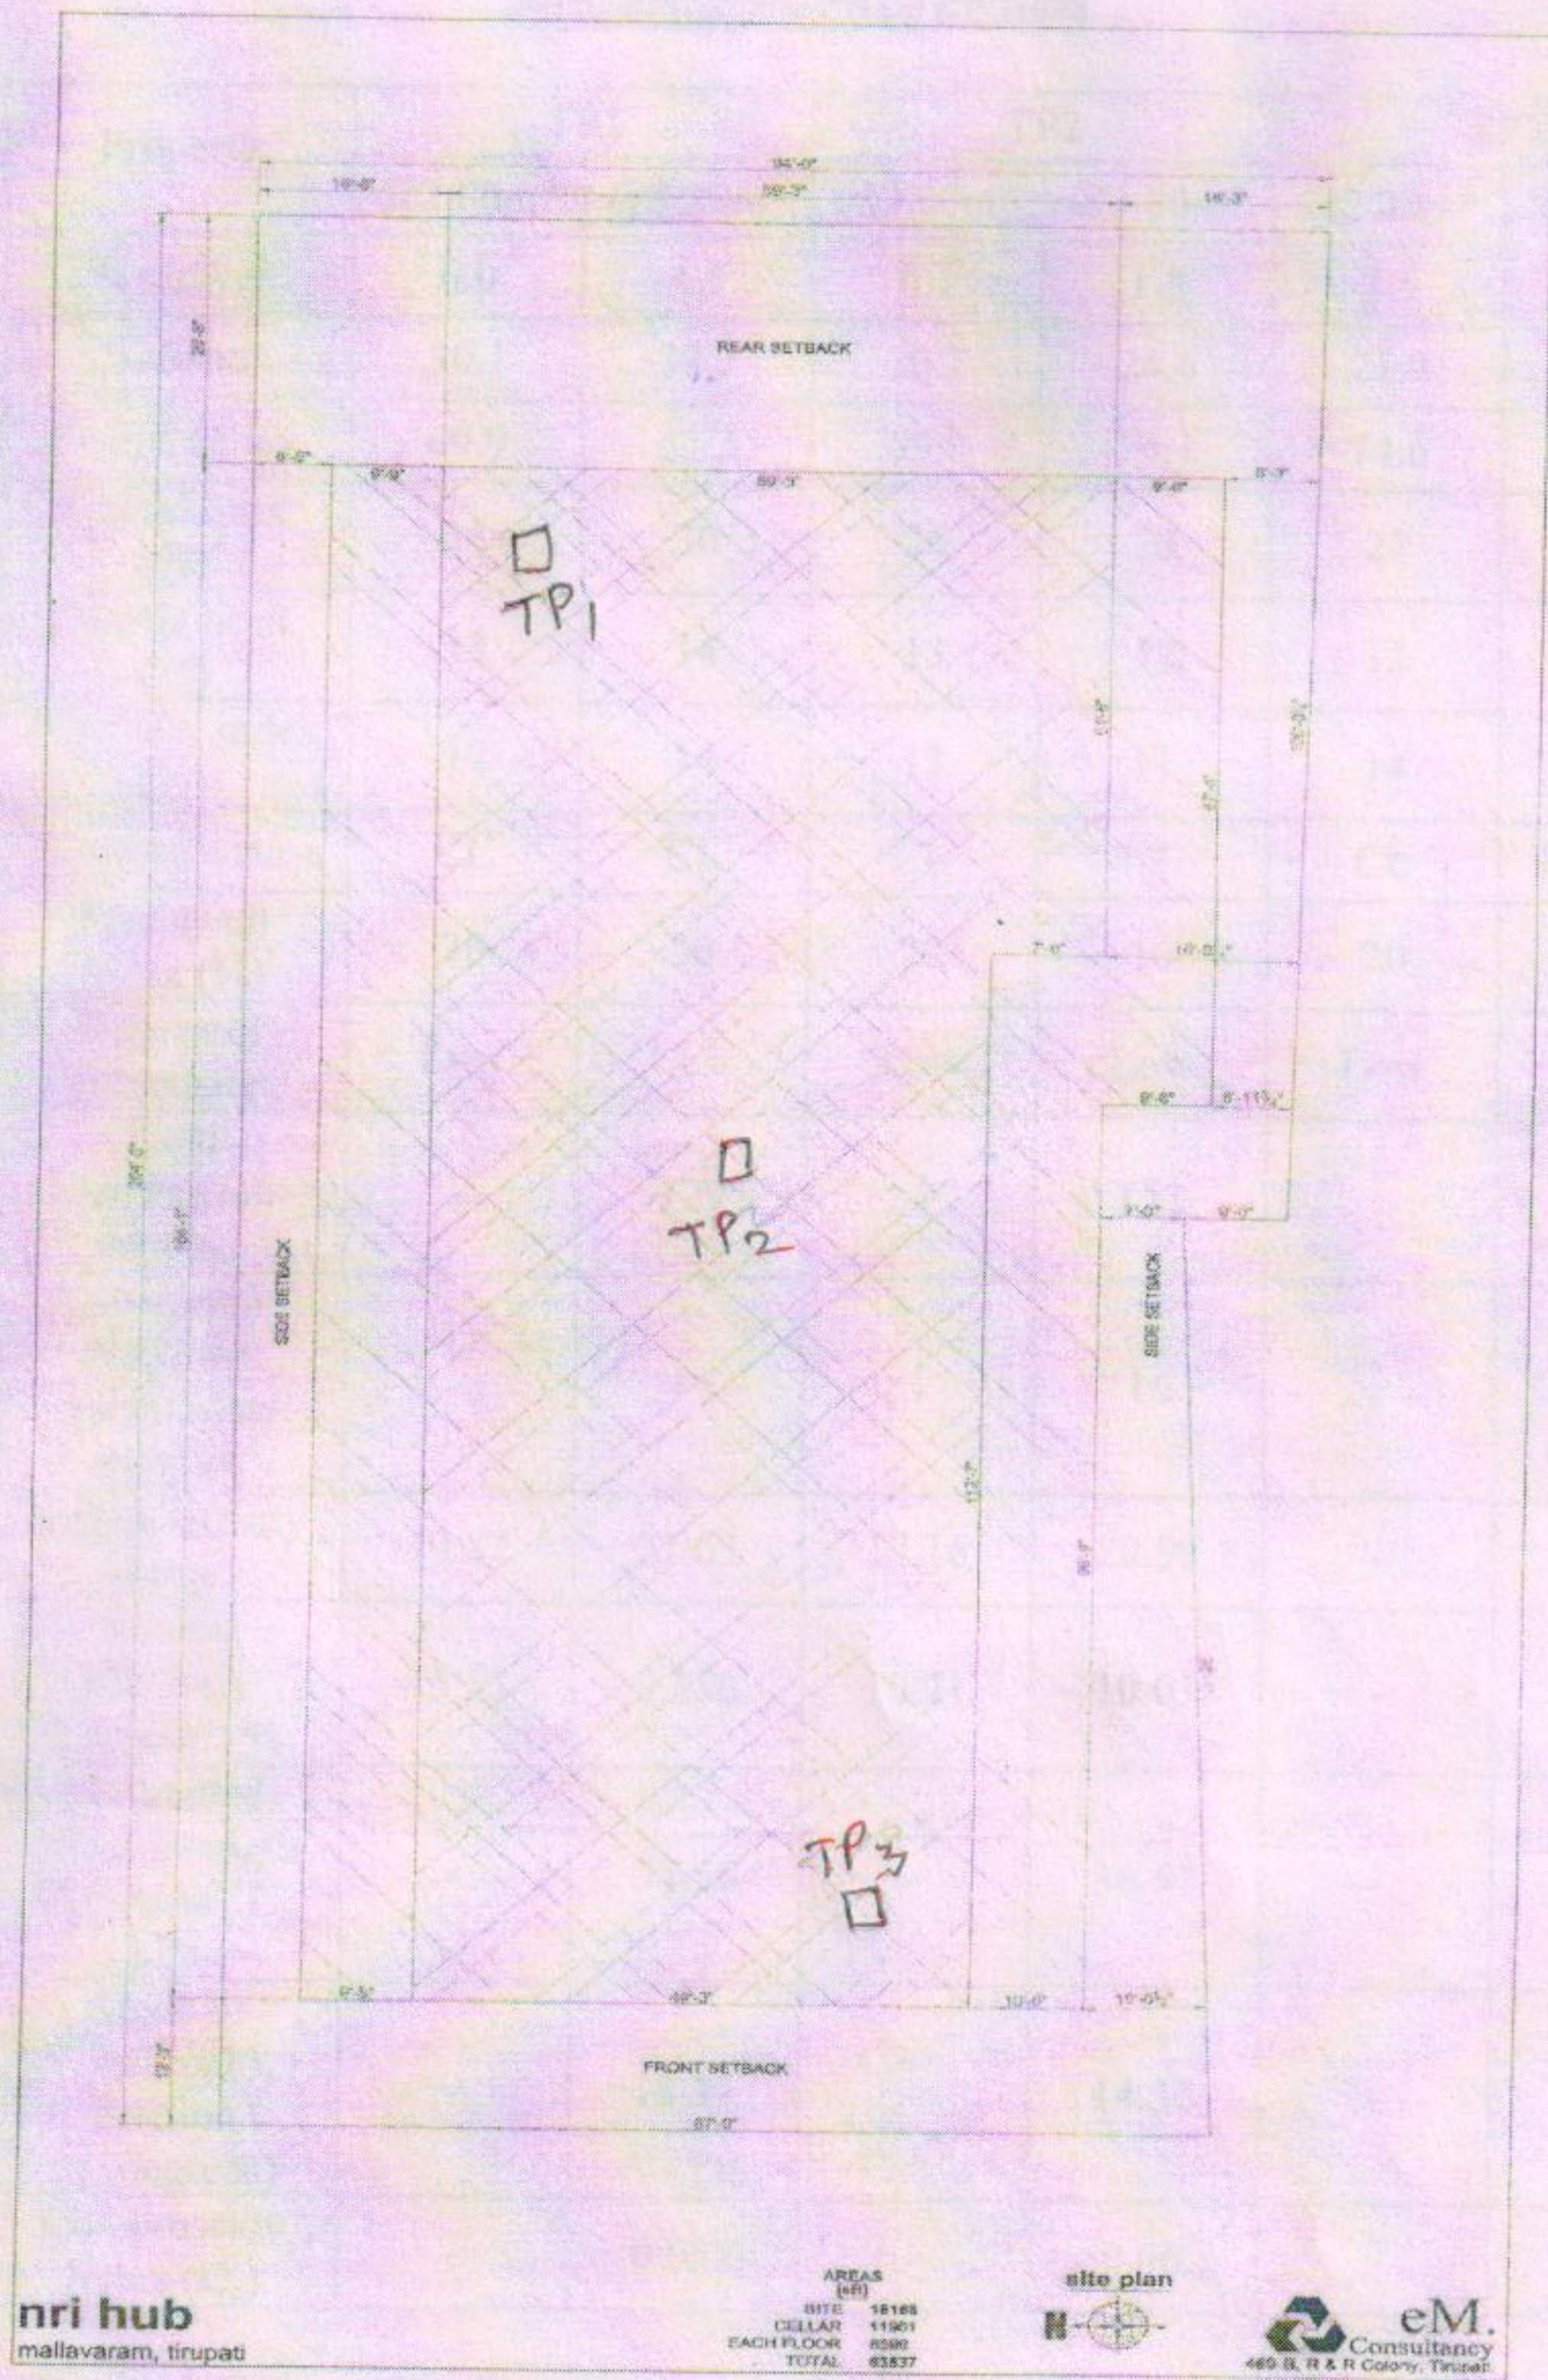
SITE LAYOUT SHOWING TRIAL PIT LOCATIONS
